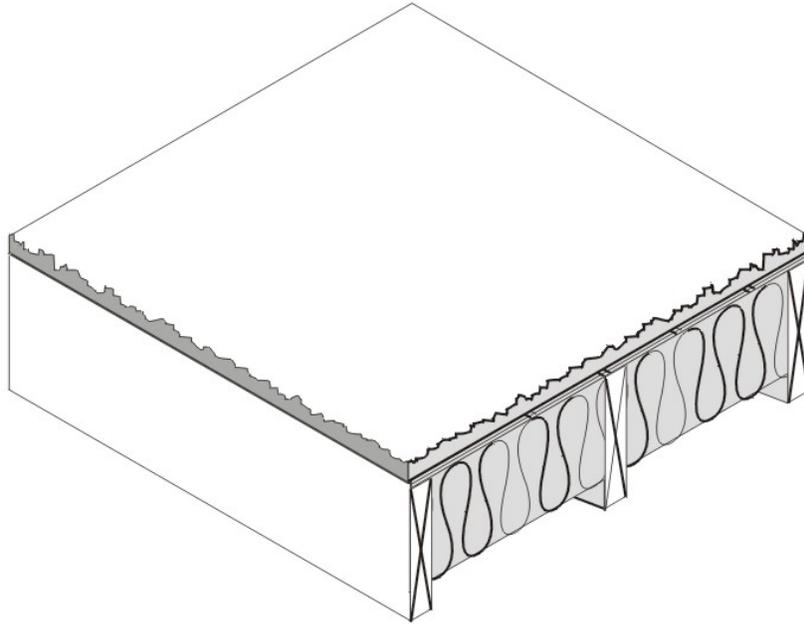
Wood Framed Floor with a Crawl Space
